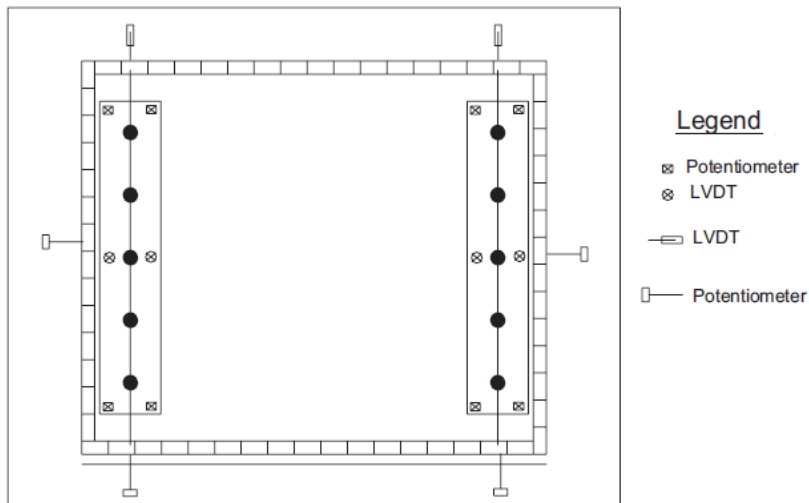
Plan view of layout out of instrumentation in TFHRC - NCHRP full-scale- GRS abutment Colorado (CO) (Wu et. al. 2006)
